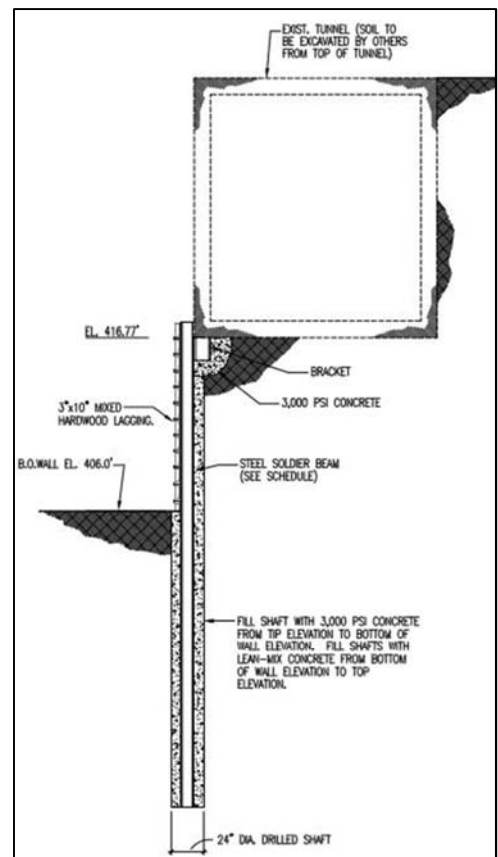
Hybrid of Soldier Beam and Underpinning System at Existing Tunnel
